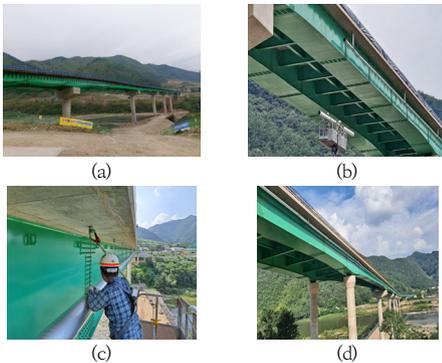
Jeongseon 3 bridge's drainage system installation status using developed embedded anchor and drainage pipe support system
